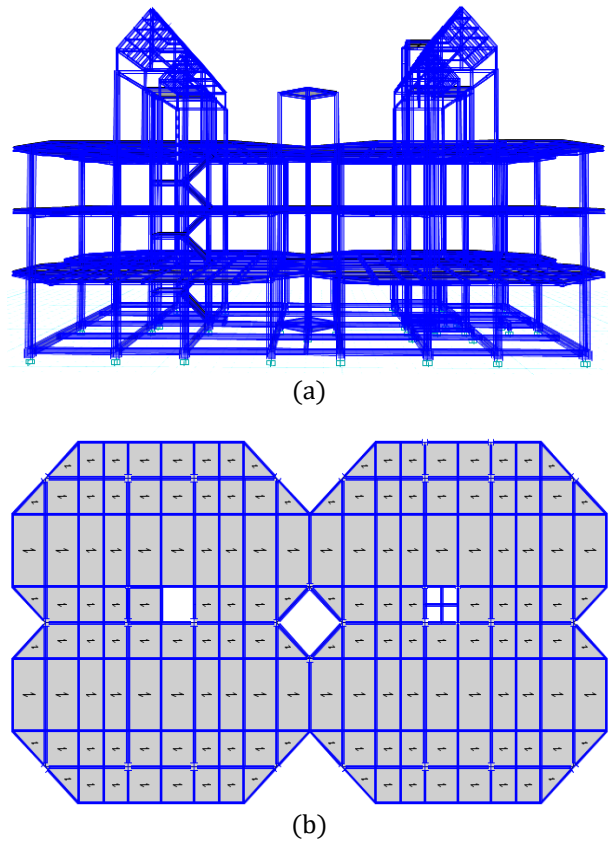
Structure model: (a) front view; (b) typical plan view of the model.
